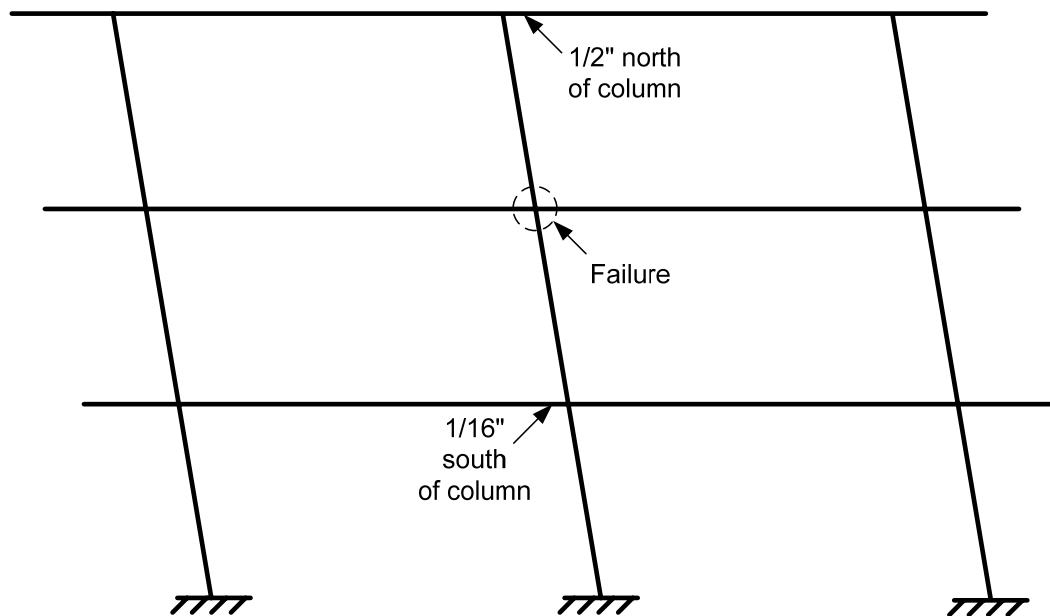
Vertical Slab Separation Frame B, South 3% Roof Drift
